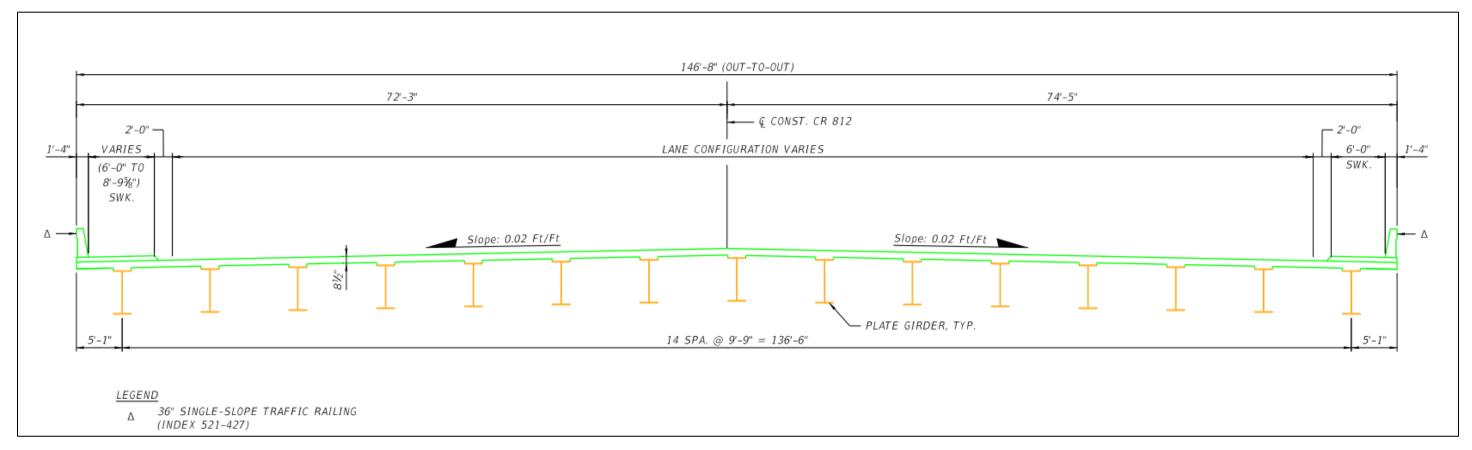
Lantana Road Bridge Over SR 9/I-95 (930276) Typical Section
